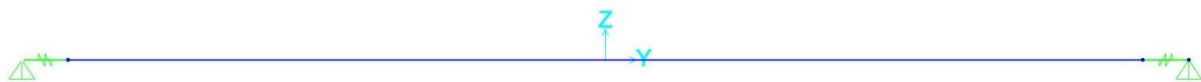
Spring SAP2000 Model – idealization of a typical timber joist
